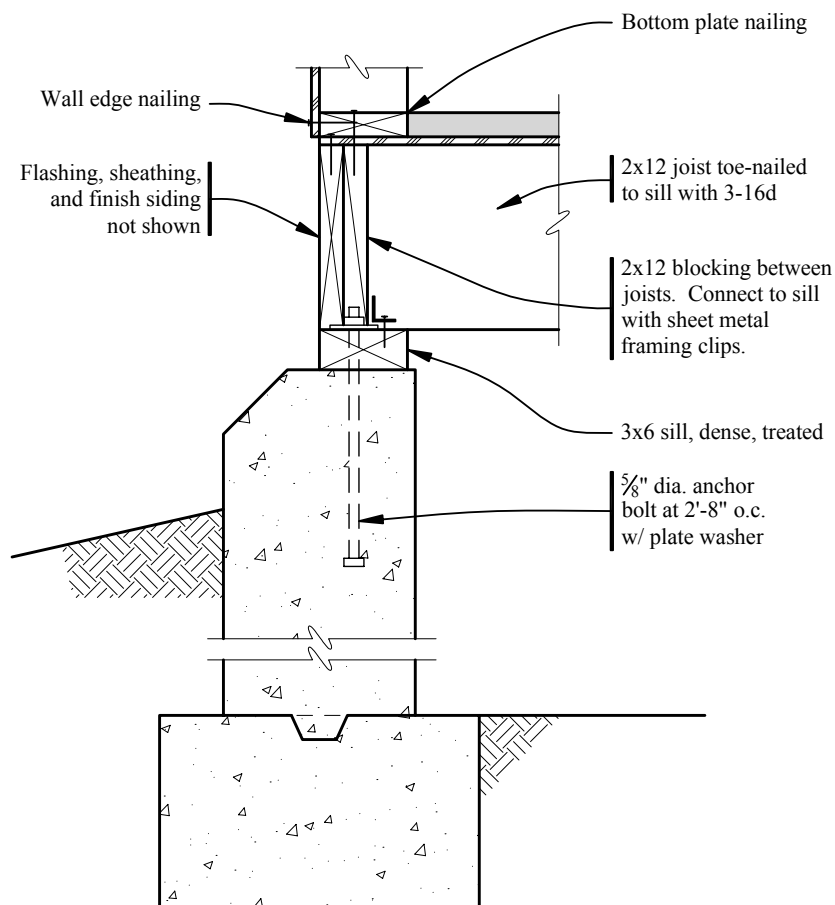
Nonbearing wall (1.0 in. = 25.4 mm).
